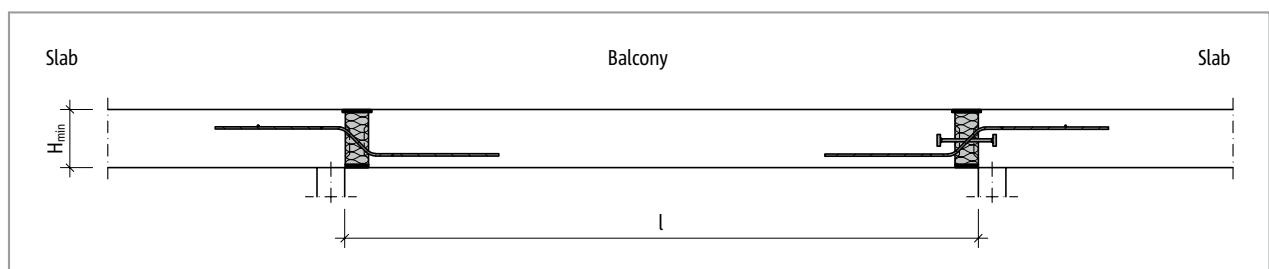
Schöck Isokorb® T type Q-PZ, Q-P: Static system
